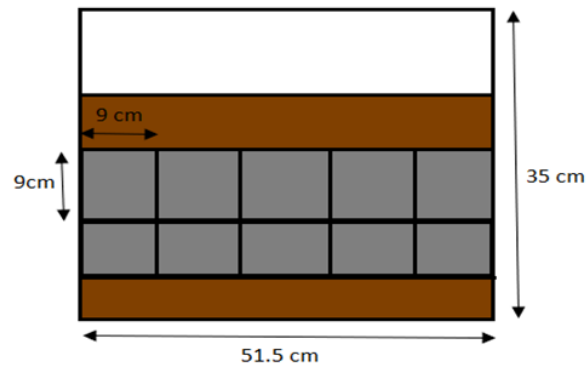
Side view of soil slope with gabion type retaining wall.
